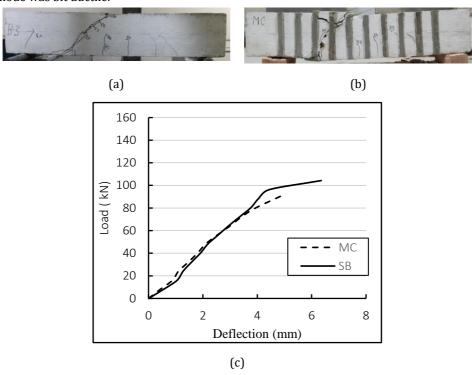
(a) Damaged beam for MC, (b) Failure mode of beam MC, (c) Deflections of beams MC and SB
